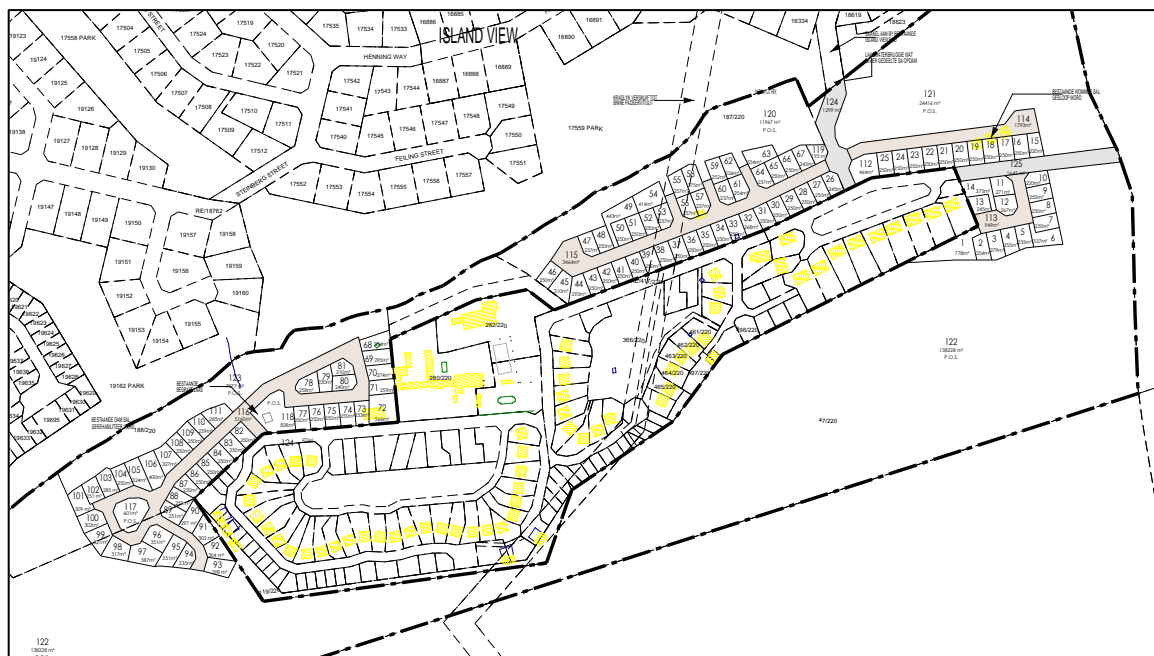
PRIVATE ROADS & PUBLIC ROADS
